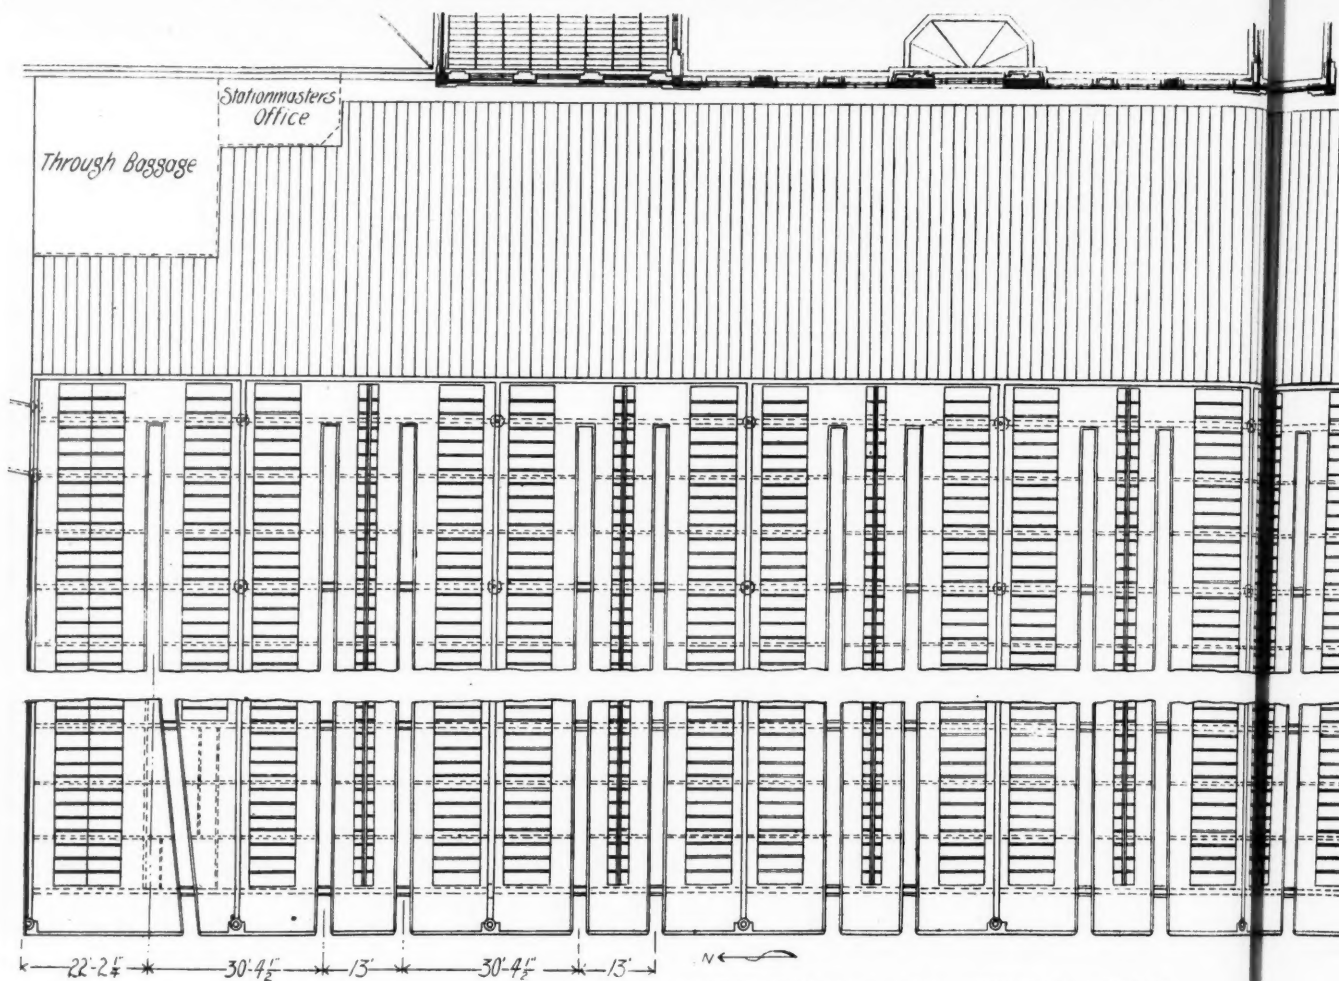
PARTIAL PLAN OF D., L. & W. TERMINAL AT HOBOKEN
